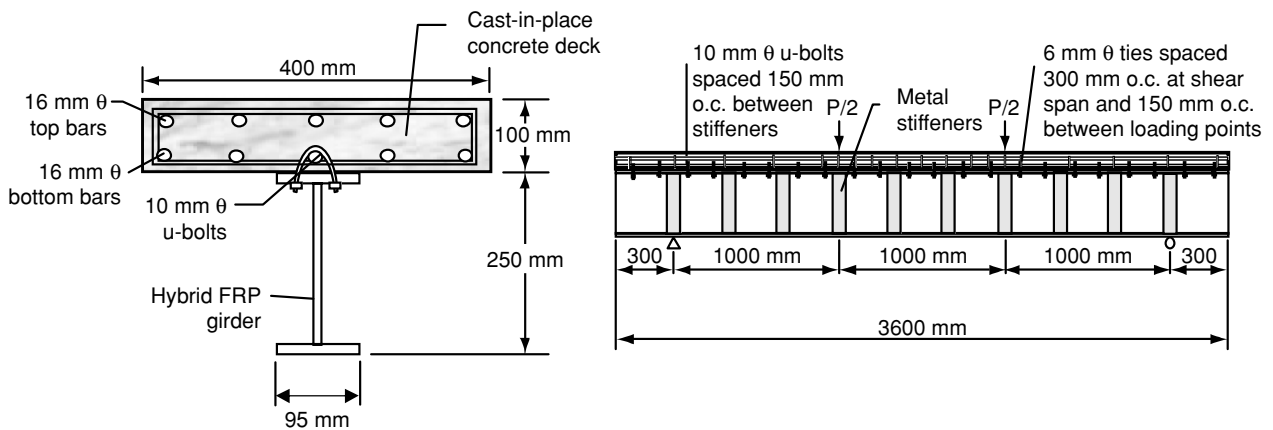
Dimensions and loading systems of specimen FRP-conc 3
